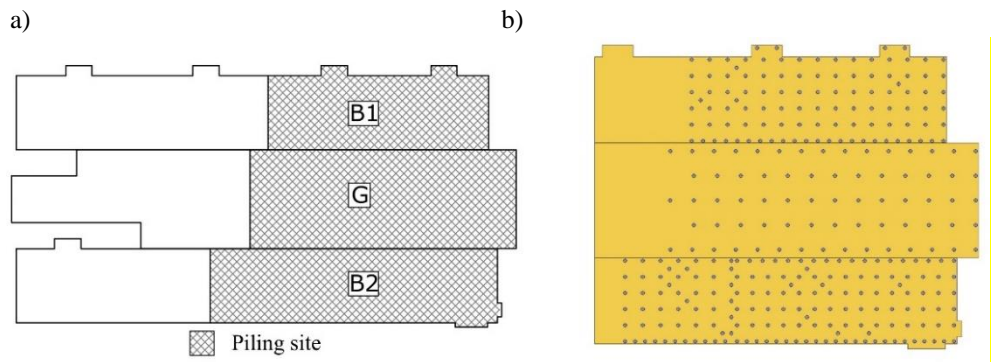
a) piling area, b) scheme of pile arrangement diagram (PL-Win model)
